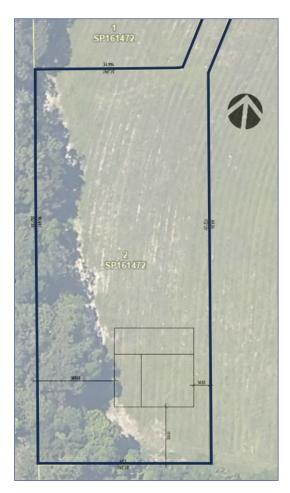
Extract from Site, Floor and Elevation Plans and Aerial Overlay (source: QLD Globe June 2023
